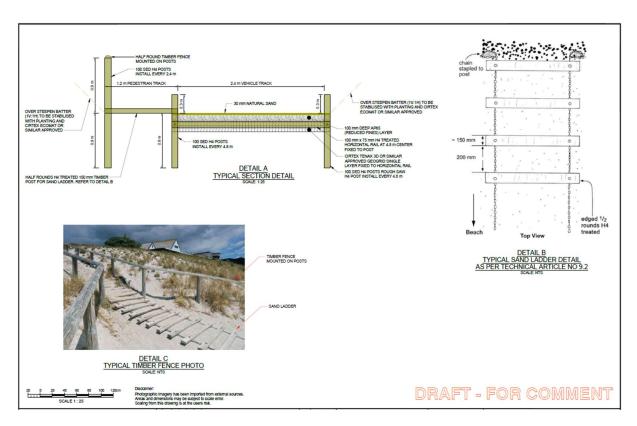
Accessway design details (BTW 2025; Appendix A).
